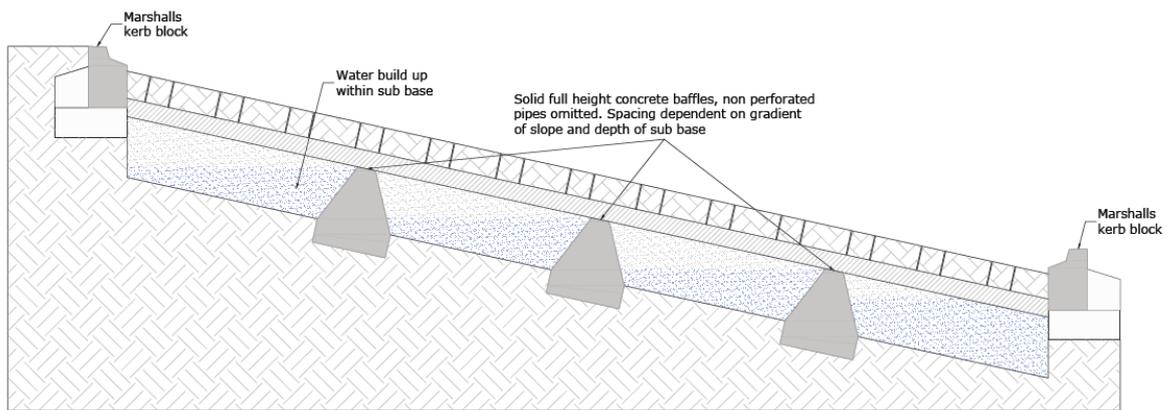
Permeable Paving Concrete Baffles [Marshalls- Permeable Paving Design Guide]
